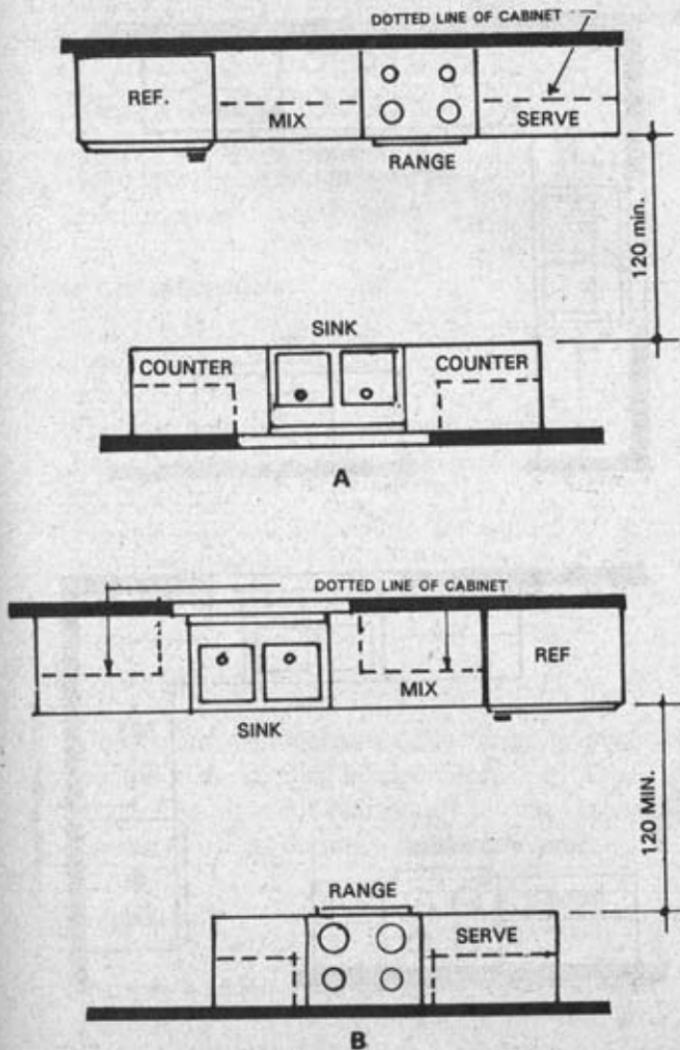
PLAN OF CORRIDOR TYPE KITCHEN
